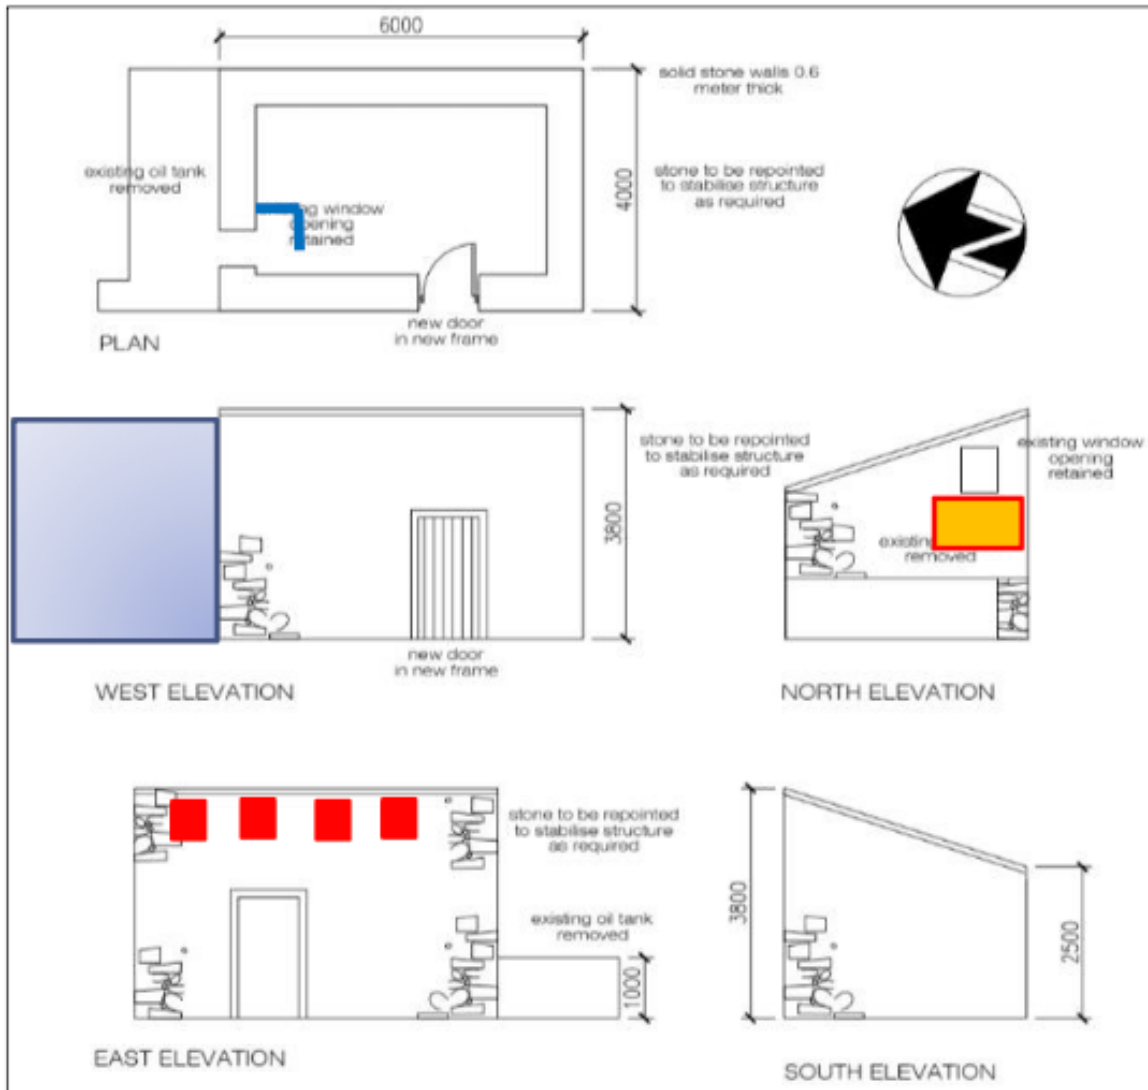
Drawings of Building 3 and proposed bat mitigation works.
